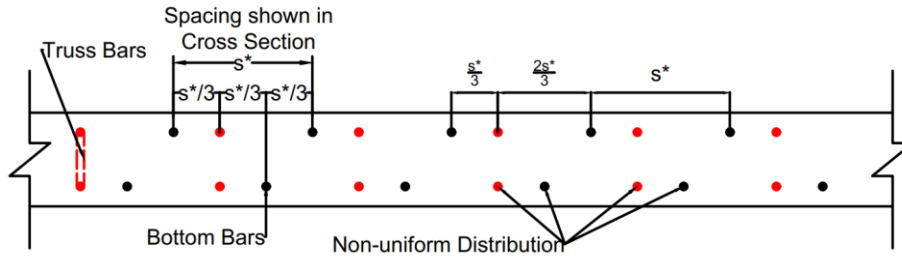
Detail 5-10 Main Reinforcement Distribution
